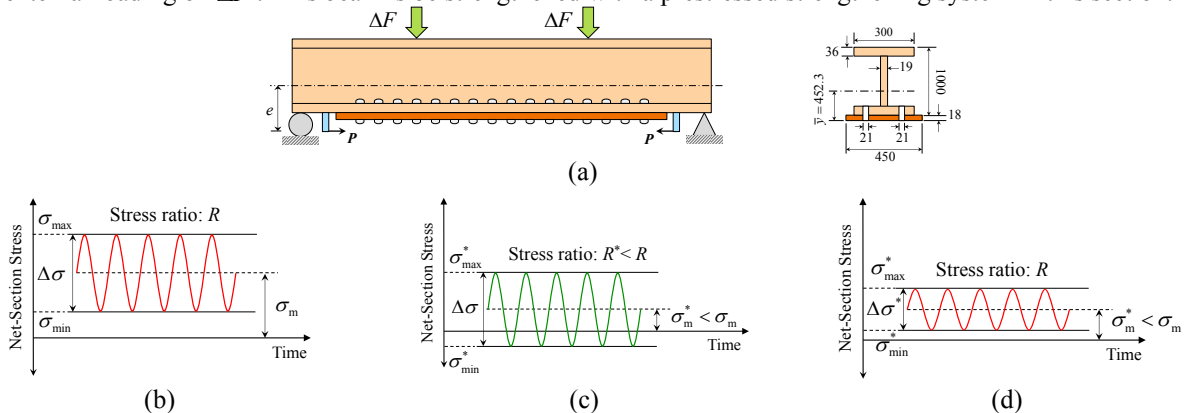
Strengthening a riveted member with prestressed and non-prestressed systems; (a) Configuration of the riveted beam (Brühwiler et al., 1990), (b) Net-section stress before prestressing, (c) Net-section stress after prestressing, (d) Net-section stress after strengthening with non-prestressed system
